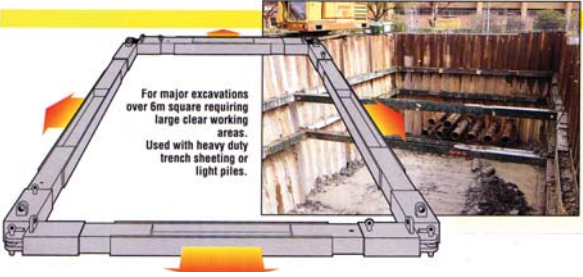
Hydraulic Bracing Frame - Double acting brace
